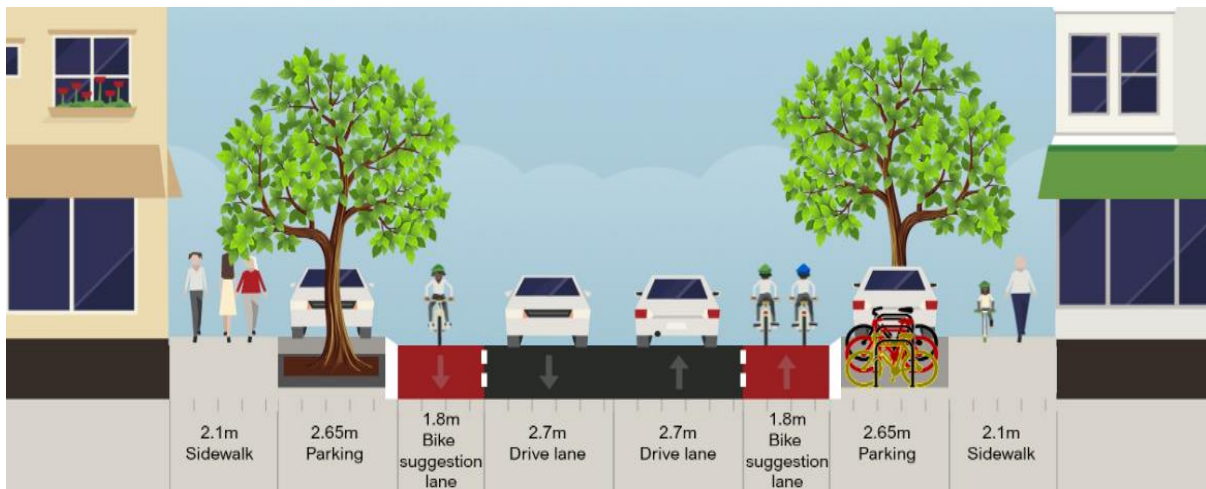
Long term redeveloped Lange Dijkstraat. Here the road is wider and parking is on the sidewalk.
